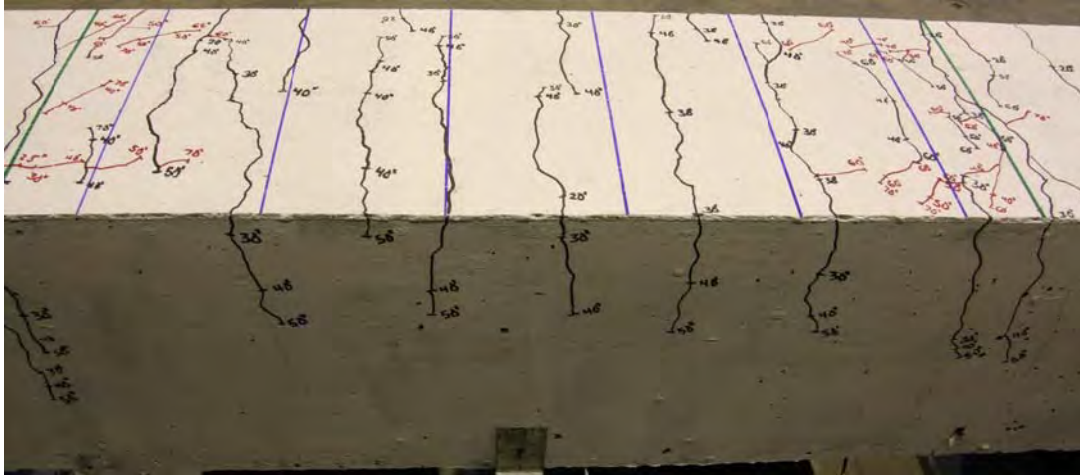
Photo. Side and top face of Beam C11-LT before failure.
